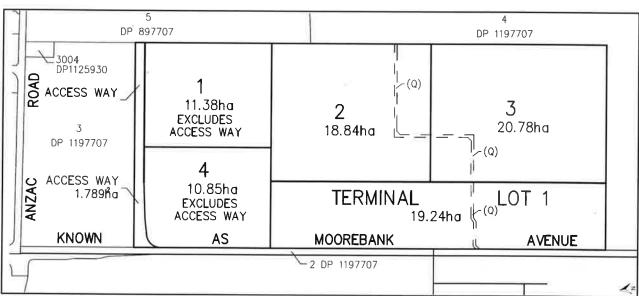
Proposed subdivision of the MPE site (Source: Applicant's EIS)
